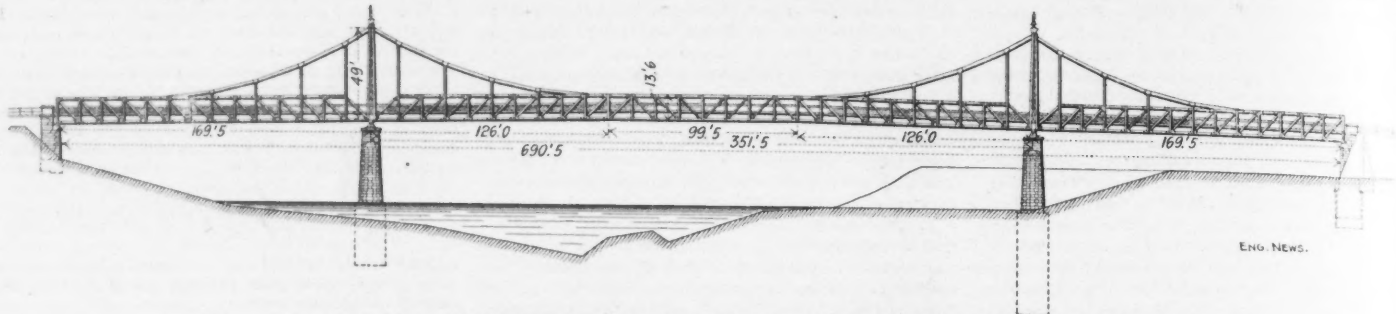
GENERAL ELEVATION OF NEW BRIDGE ACROSS THE RIVER THEISS AT TOKAJ, HUNGARY.
